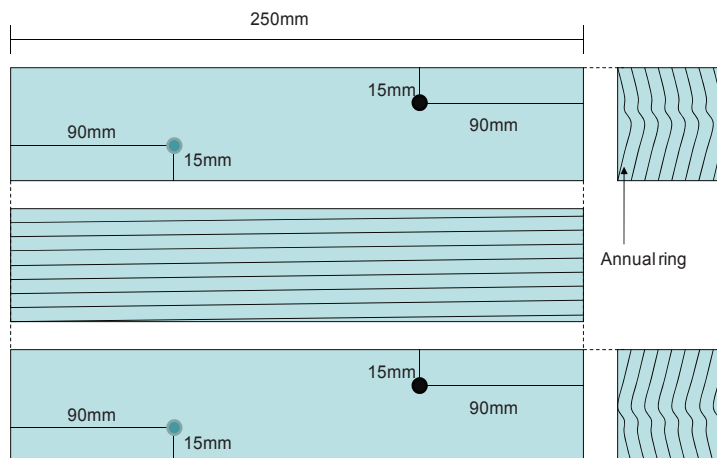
Overview of specimen (gray dot: steel nail, black dot: stainless steel nail)
